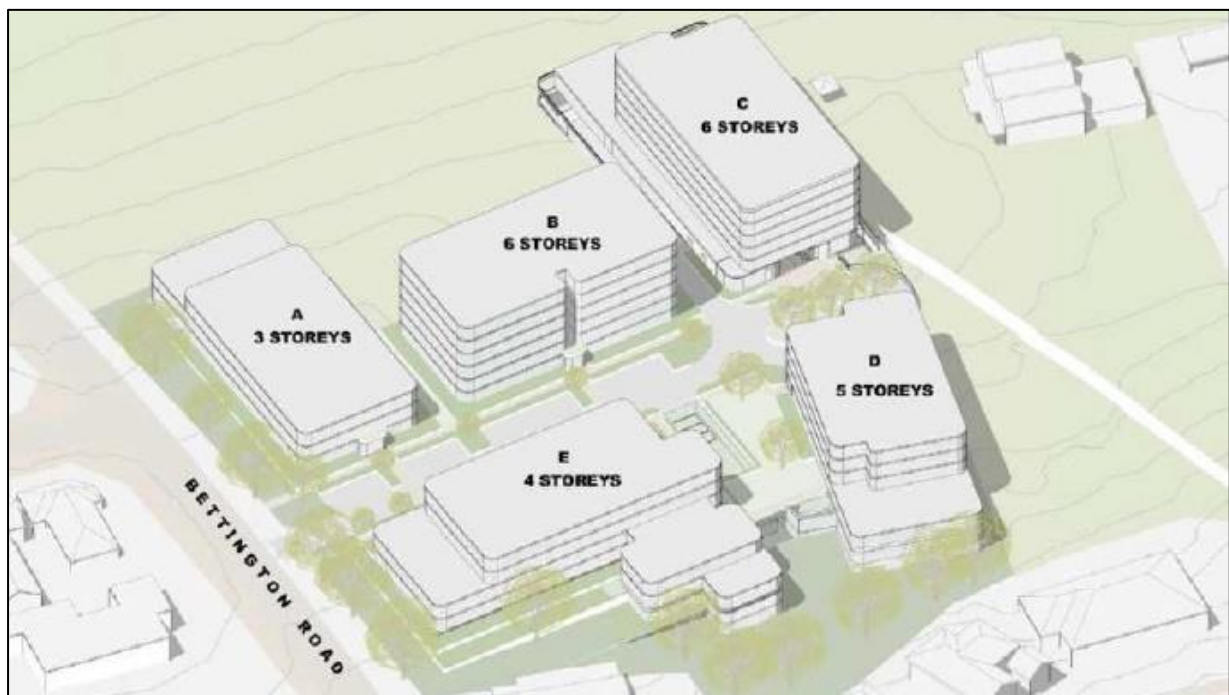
Concept Built Form Massing, Mirvac Design (source: Architectural Drawing Package, Site Compatibility Certificate) 2021
